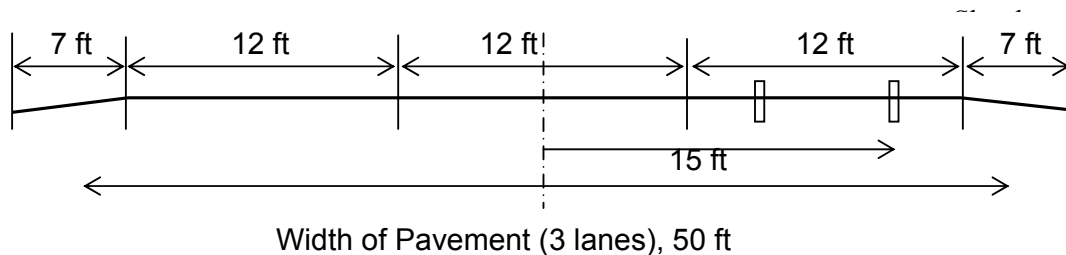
Dimension of Cross Section of the Pavement for the Austin Loop 1 Site (Frontage Road).
